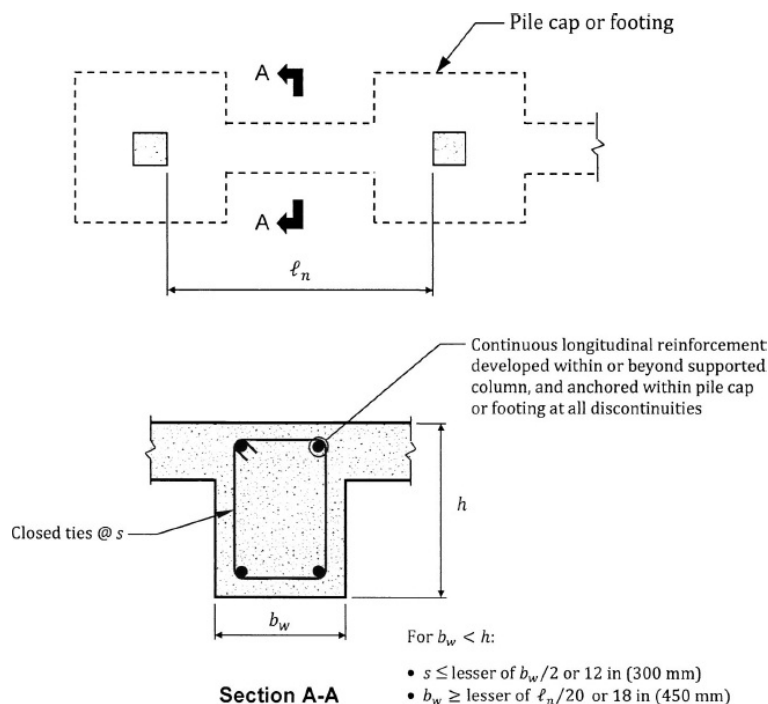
Requirements for footings, foundation mats, and pile caps.
